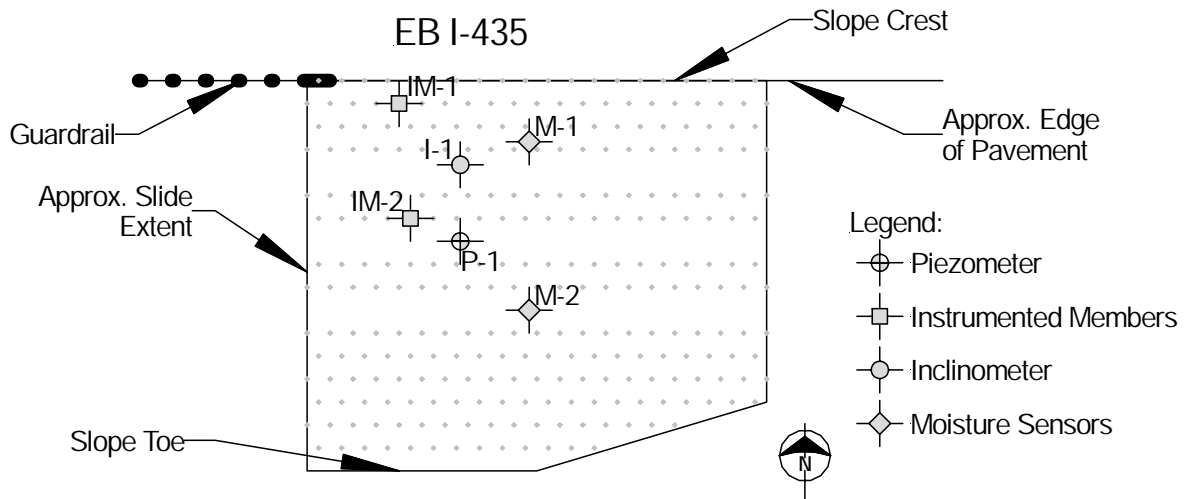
Instrumentation layout for I435-Holmes Road site.
